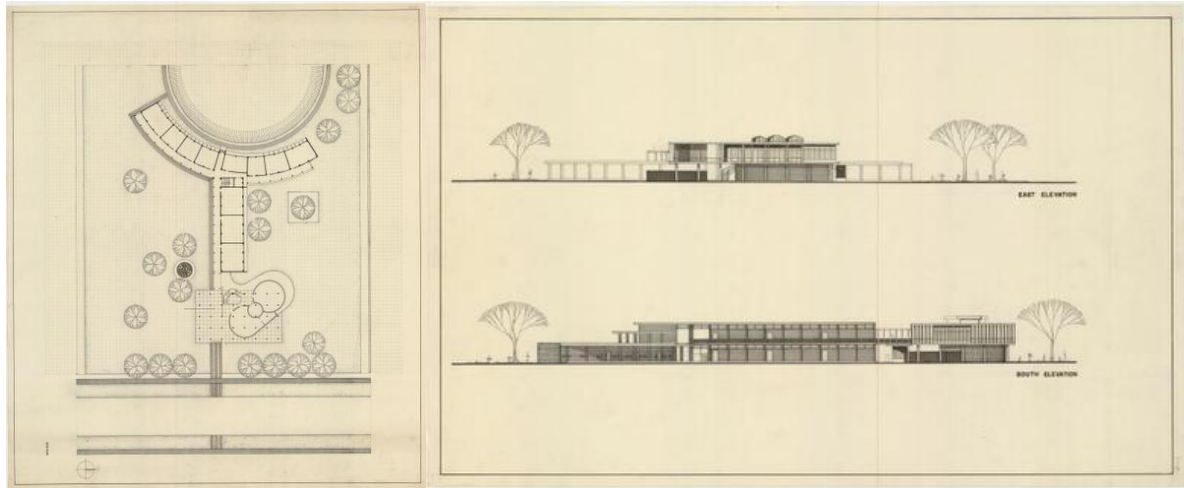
\_ Plan and Elevation (source:Muzharul Islam Archive)
